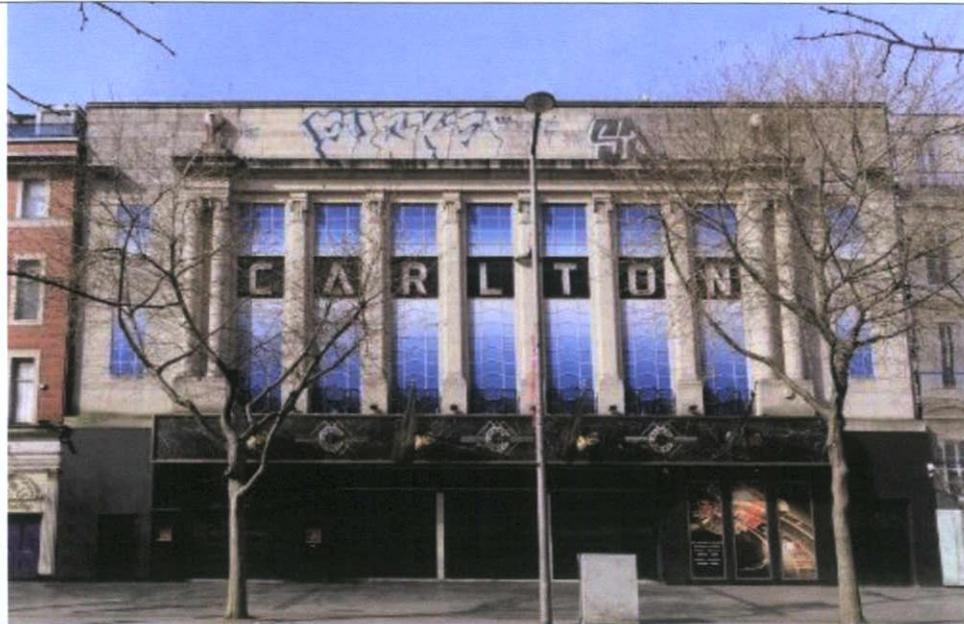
The façade of No.52-54 O'Connell Street Upper will be retained and repaired. The new development will be constructed behind the façade.
